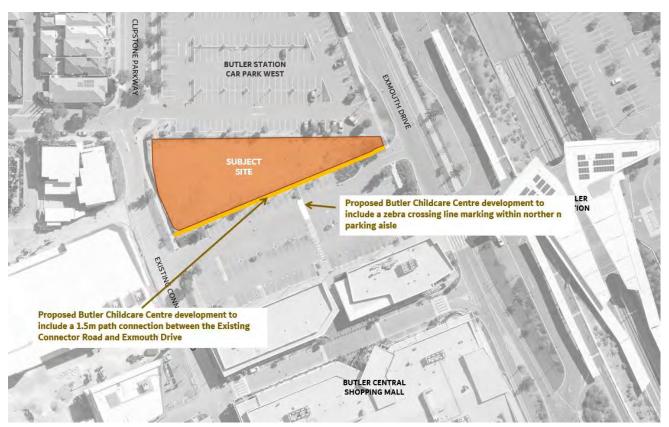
Connecting footpath infrastructure for the Butler Childcare Centre (base plan source: Peter Hobbs Architects, 2022)
